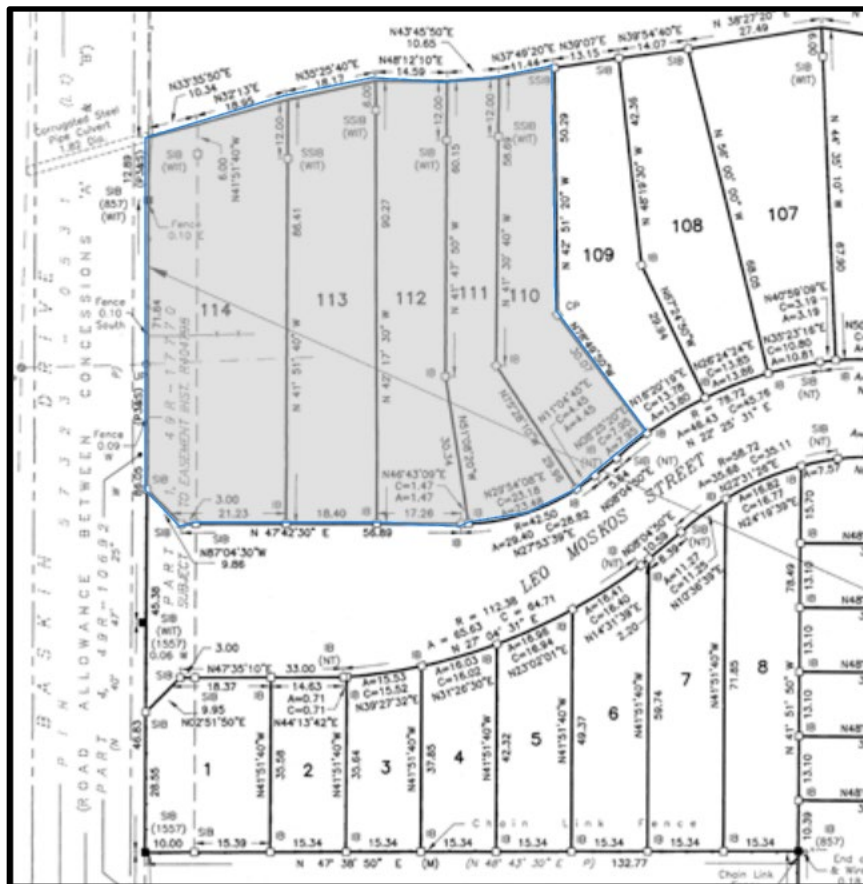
Excerpt from Draft Plan of Subdivision, identifying lots 110 through 114 under consideration.
